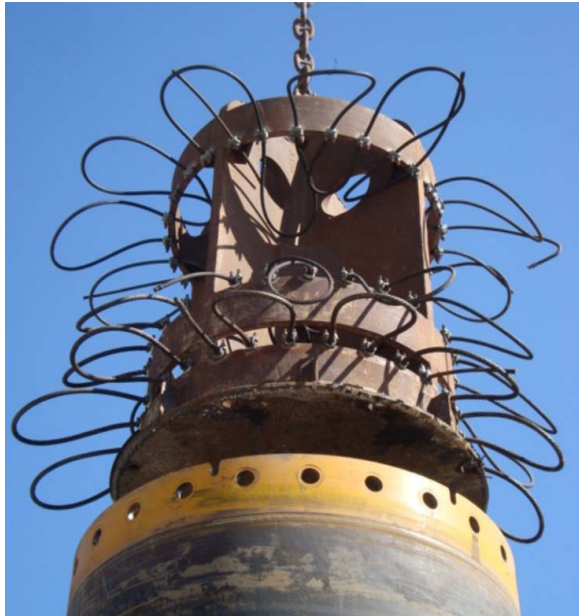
Tool Used to Tamp the Gravel Pad and Brush the Casing Interior
